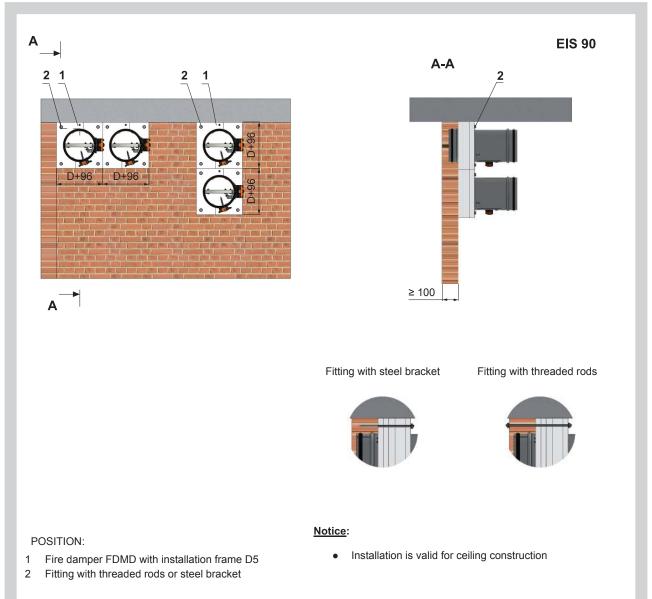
Solid wall construction - installation next to wall, ceiling - installation frame
